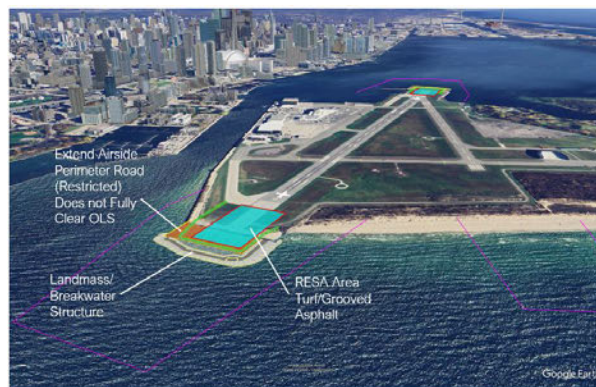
Alternative 4 RESA Minimum Landmass Conceptual Site Plan
